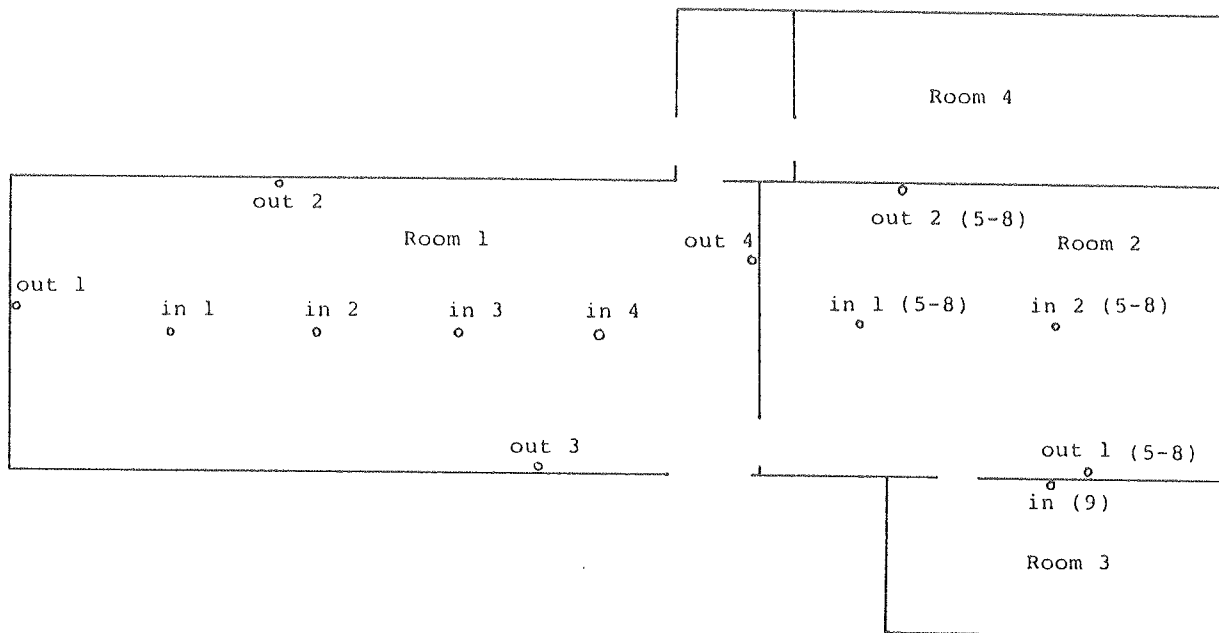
Plan of the brick-beam workshop showing air inlets and outlets from the MF-panel to the building.
